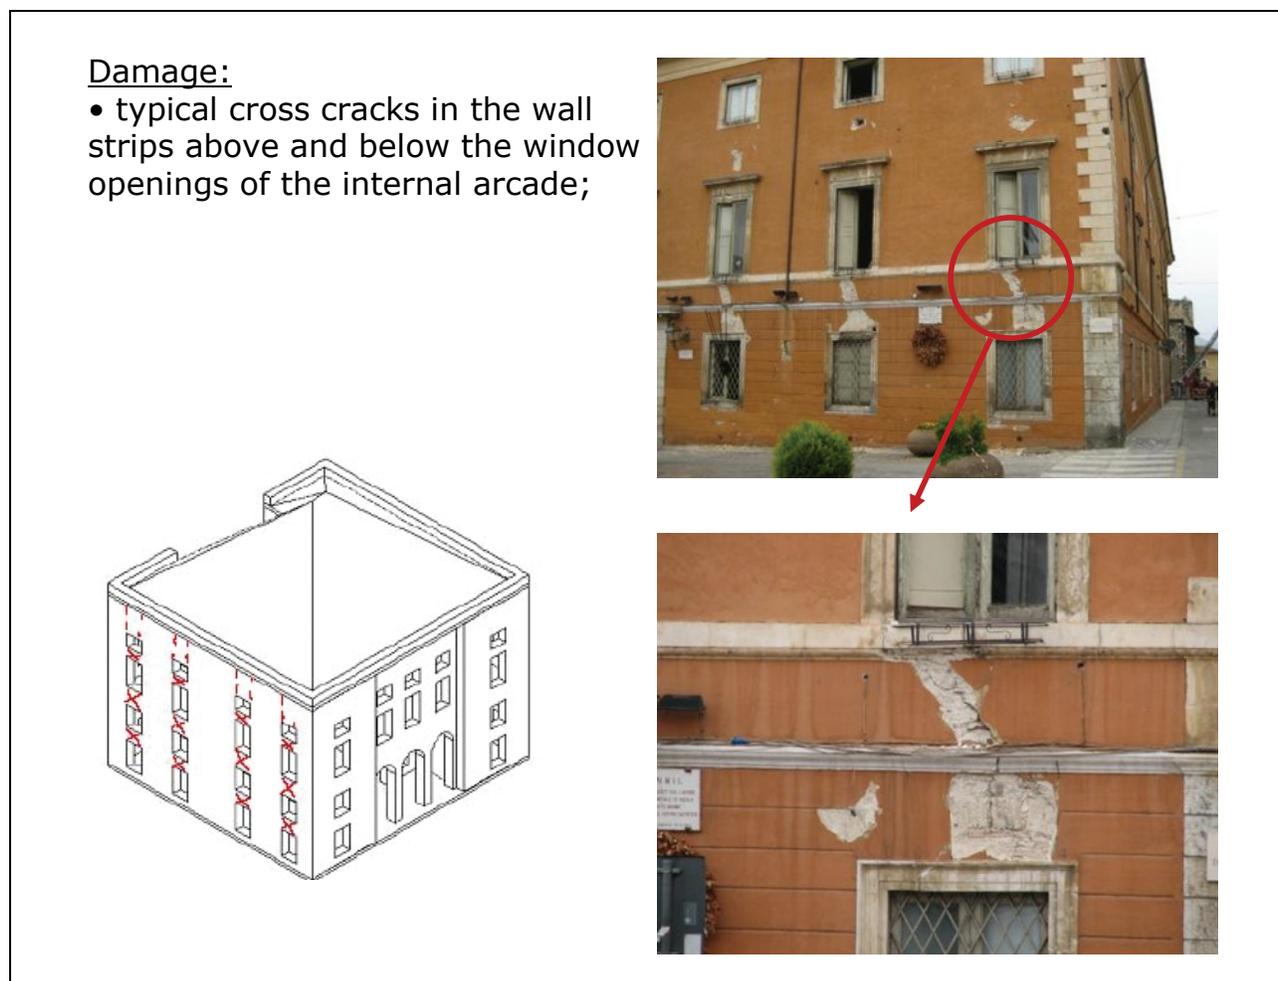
Cracks in the masonry strips of the facade of Piazza Palazzo
